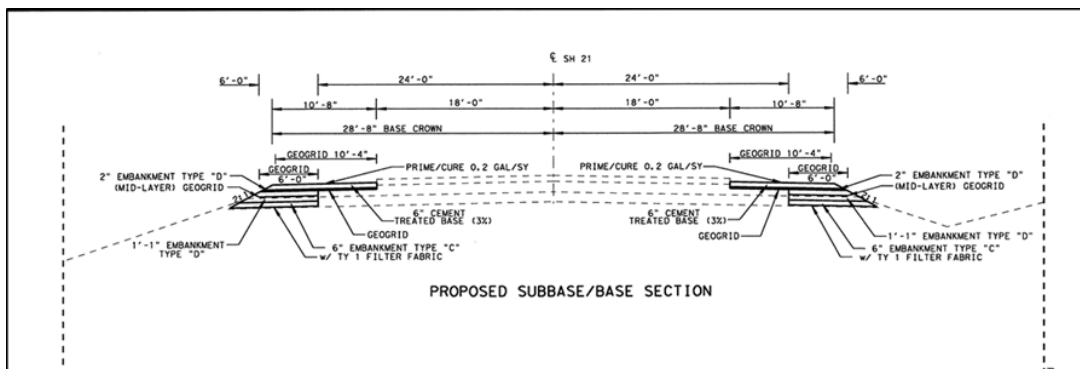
Construction of new shoulder (design plans for SH-21 from TxDOT)
